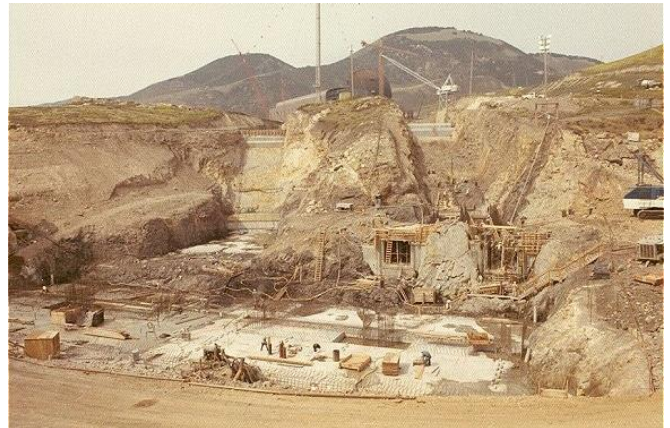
Undated photo of Intake Structure and the tunnels within it construction, looking northeast at cove bed. The north half of the Turbine Building (Building 101) is visible in the background. Source: PG&E Archives.
